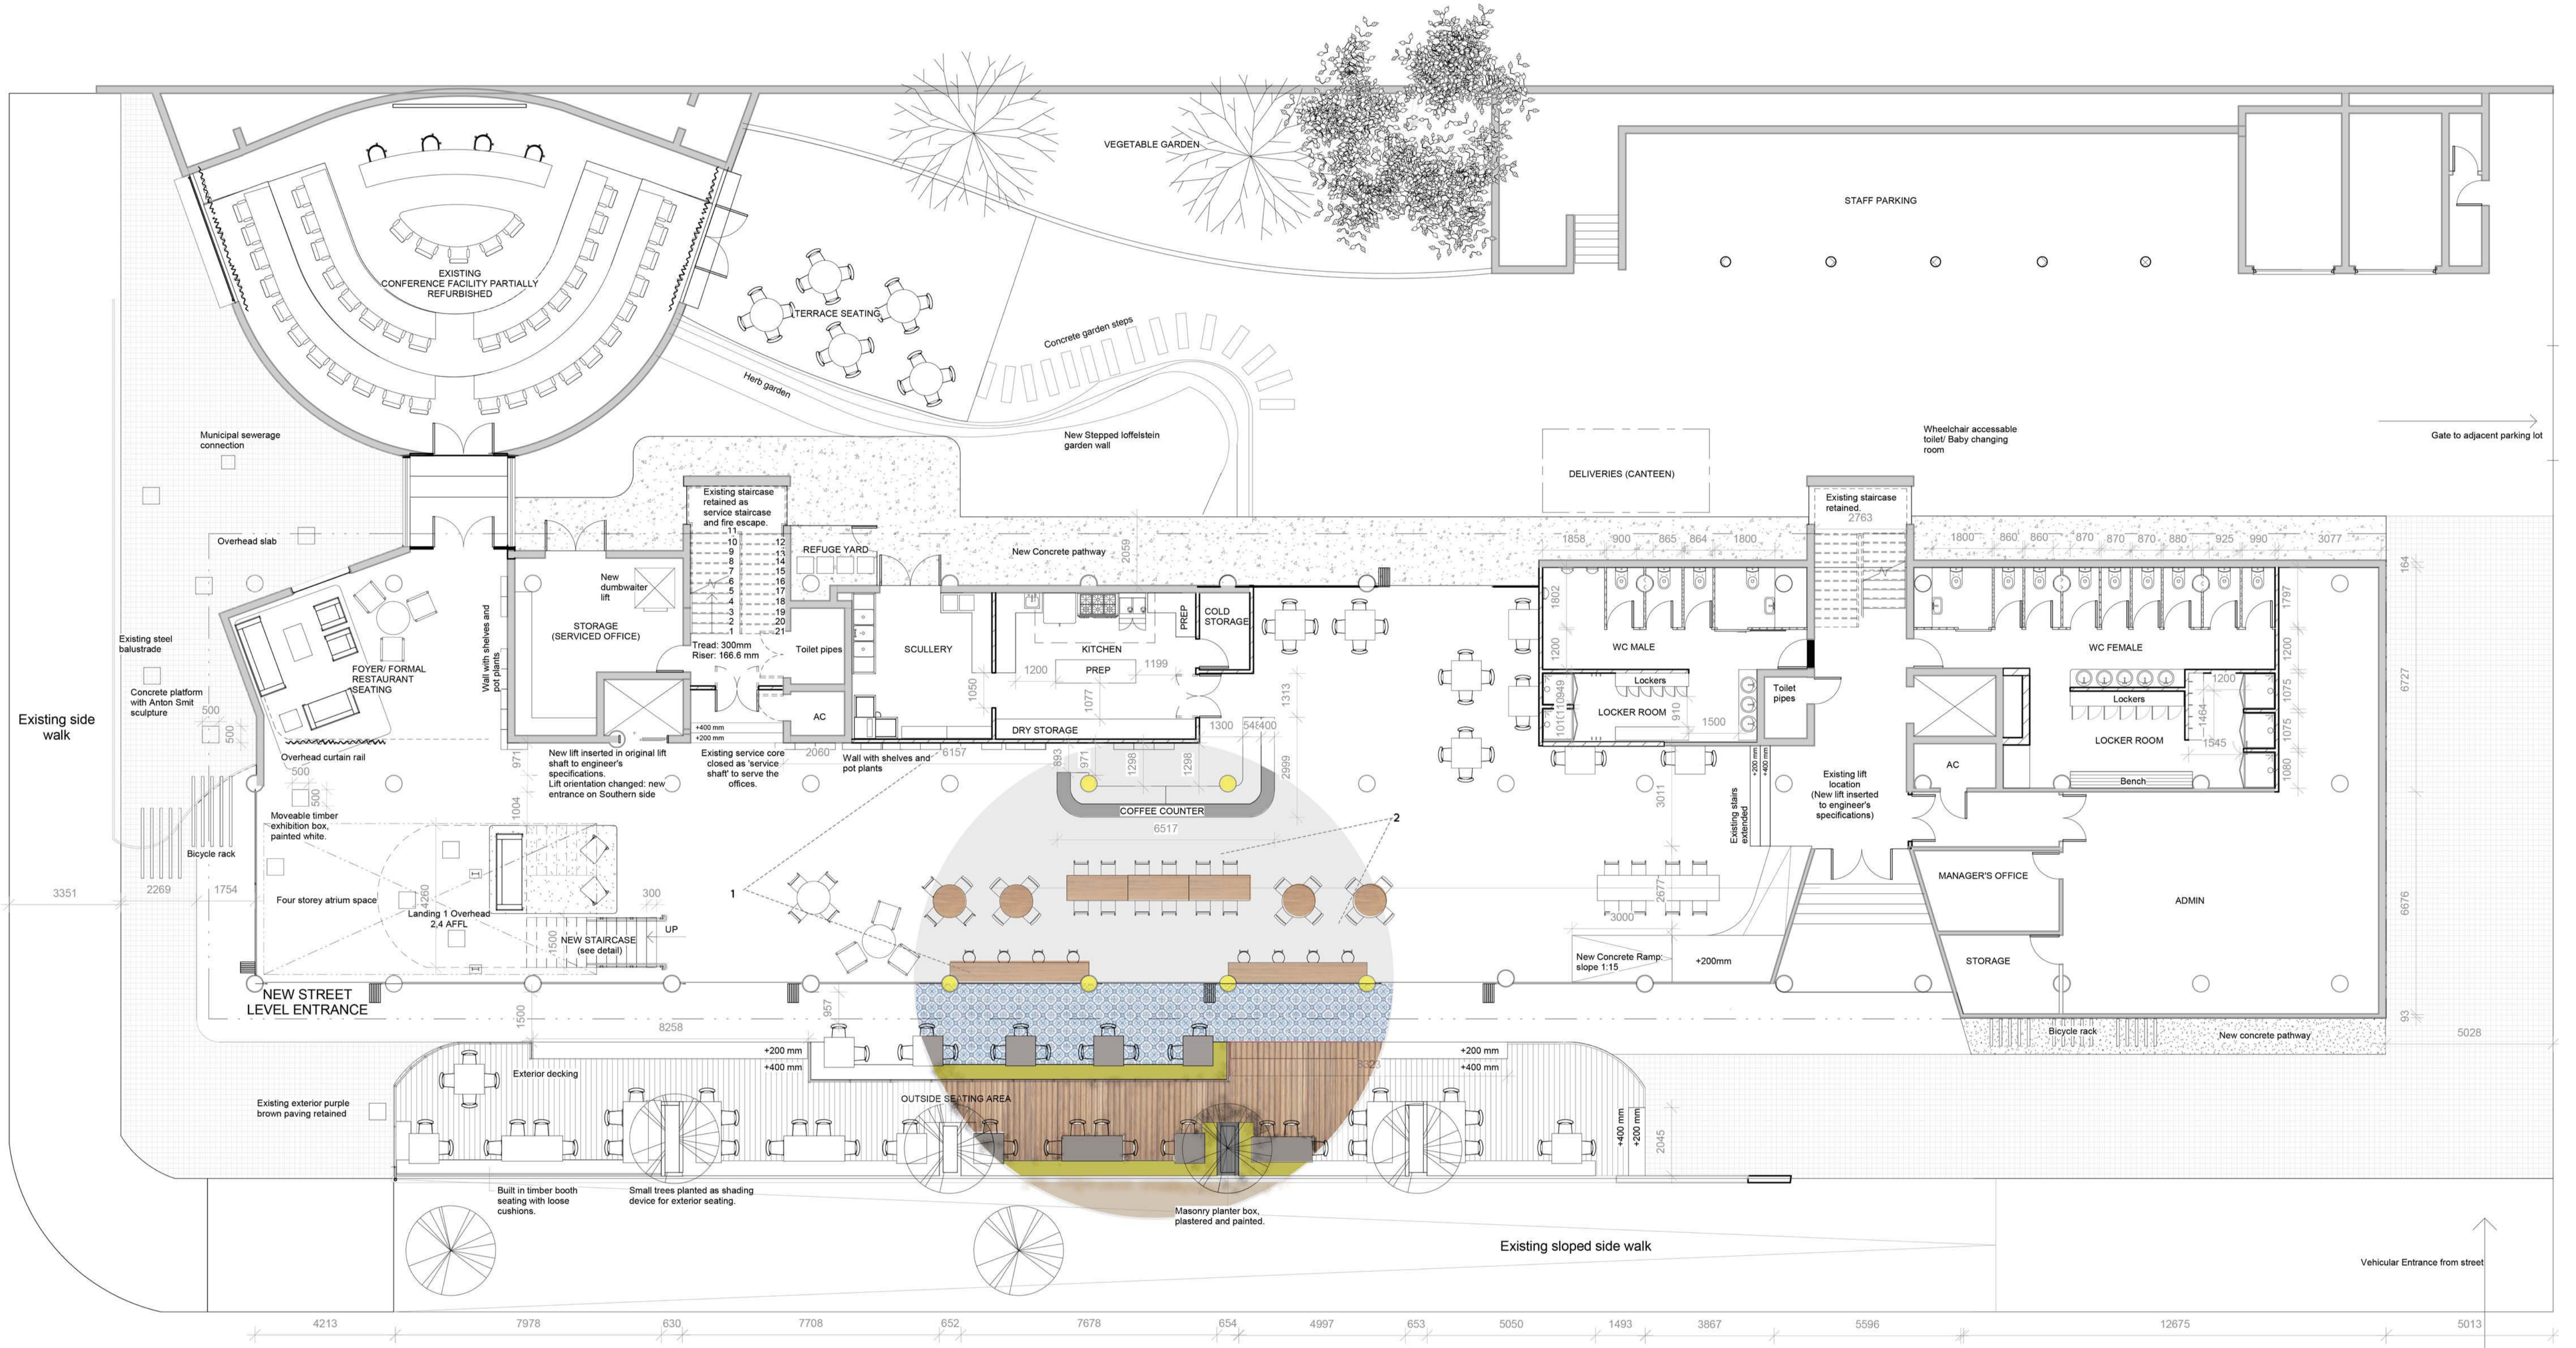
LOWER GROUND FLOOR PLAN SCALE 1:100
